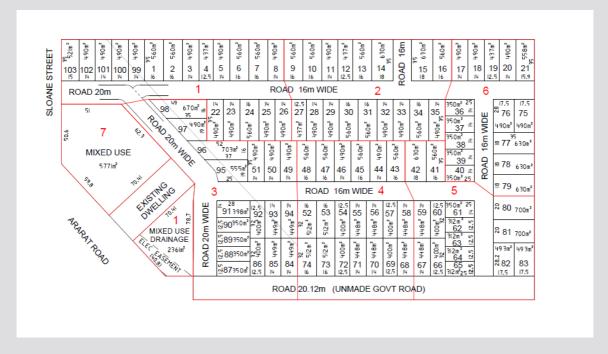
Approved Residential Development under Planning Permit 5.2021.74.1
